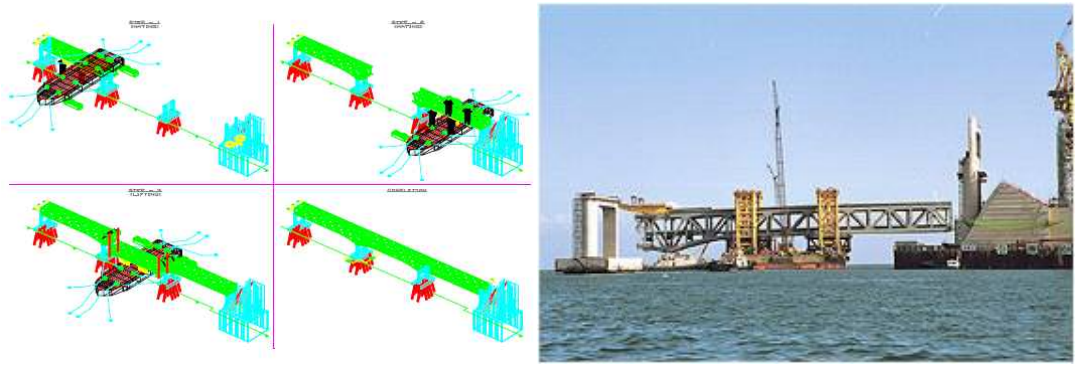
Installation Sequence and Actual Picture for Truss Bridge
